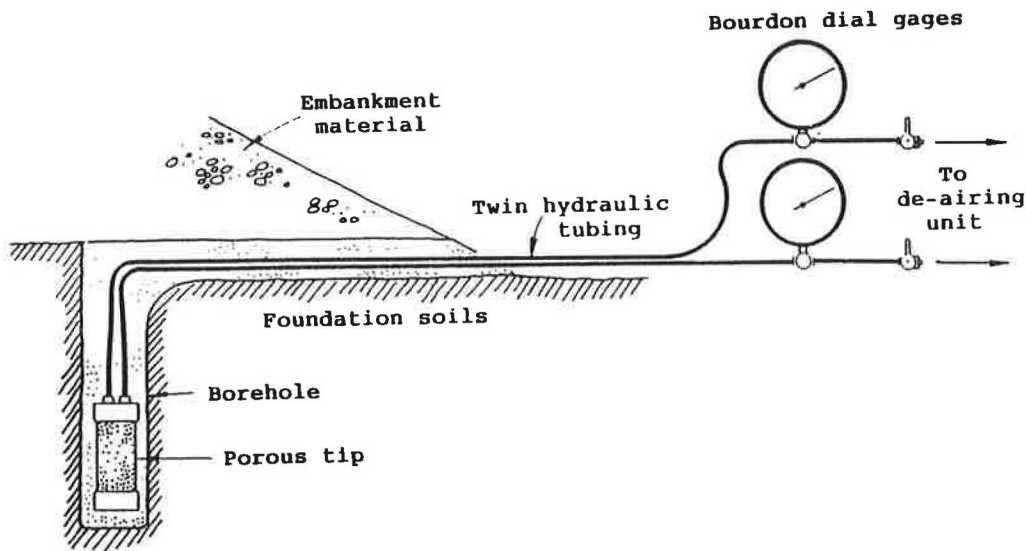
Twin tube hydraulic piezometer (Courtesy of Geotechnical Instruments, Inc.).
